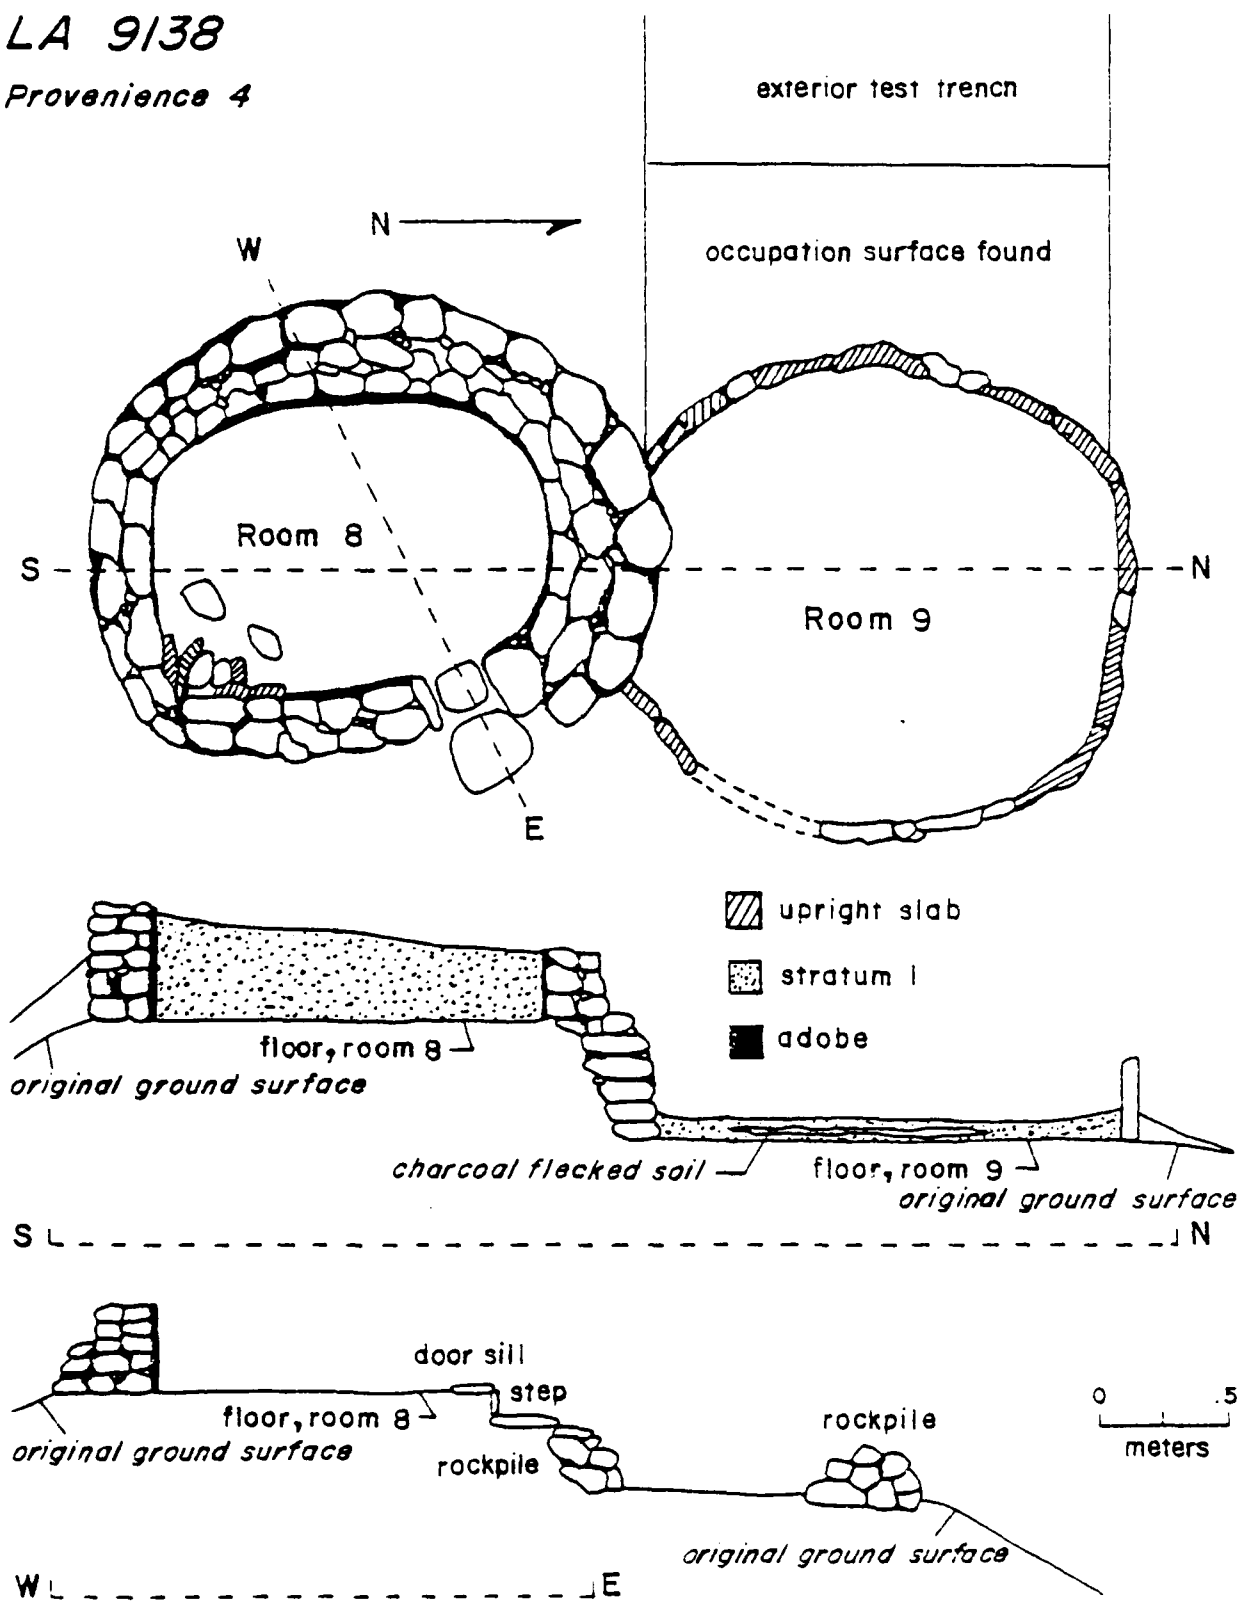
LA 9138—Rooms 8 and 9, plan view and cross sections
